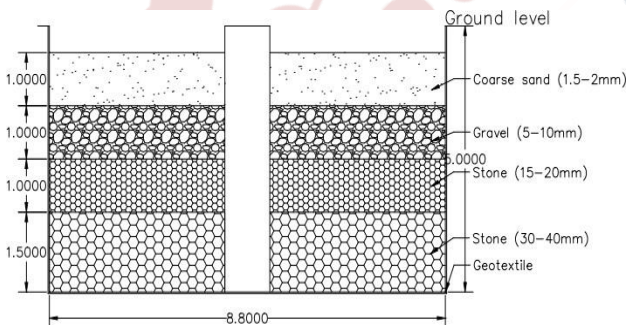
Sectional view of Recharge pit near Main block (all dimensions are in m)
